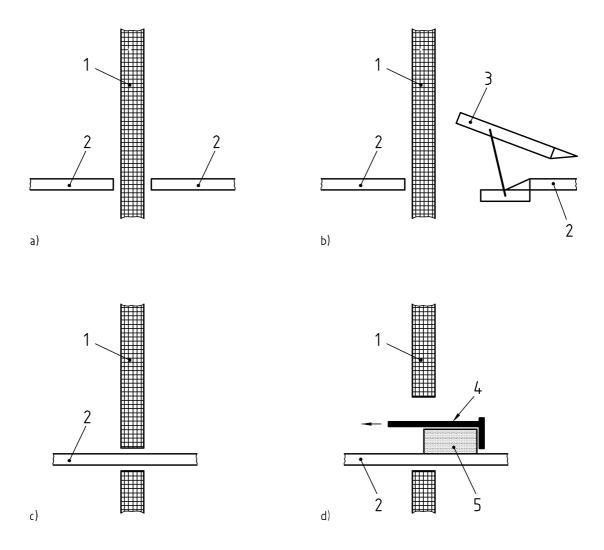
Closure and conveyor system assemblies; schematic arrangement with supporting construction, vertical installation; horizontal cross section
